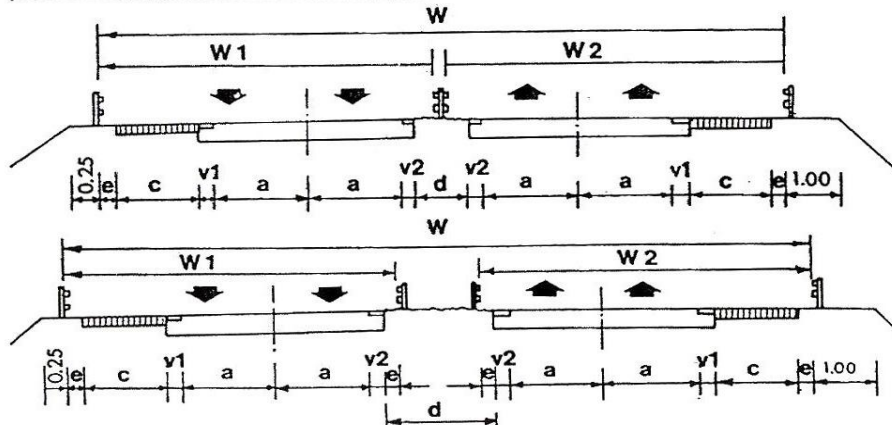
/1: Typical Details of Rural Highways [4, p.II-2]
